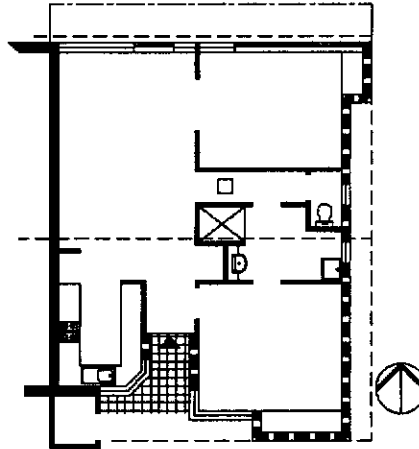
Plan of more spacious two bedroom dwelling (80m²)
